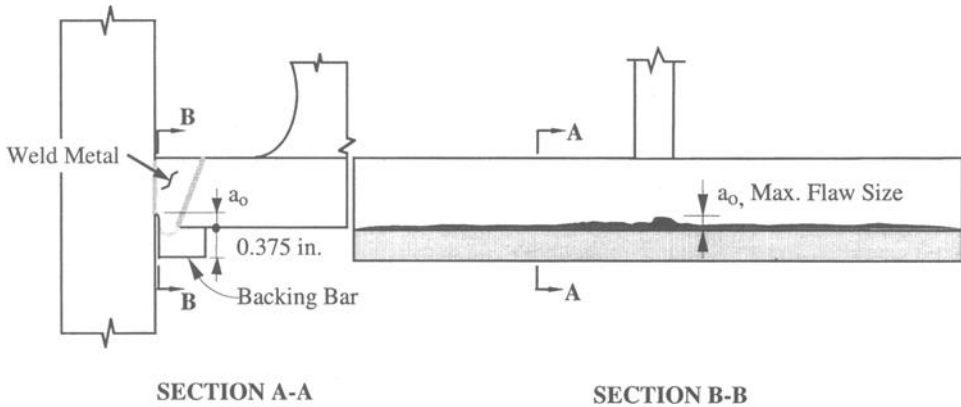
Detail of backing bar gap and weld root imperfections.
